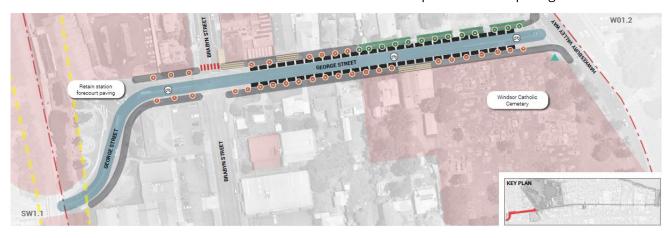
Proposed upgrades for W01.1 George Street Green Boulevard
